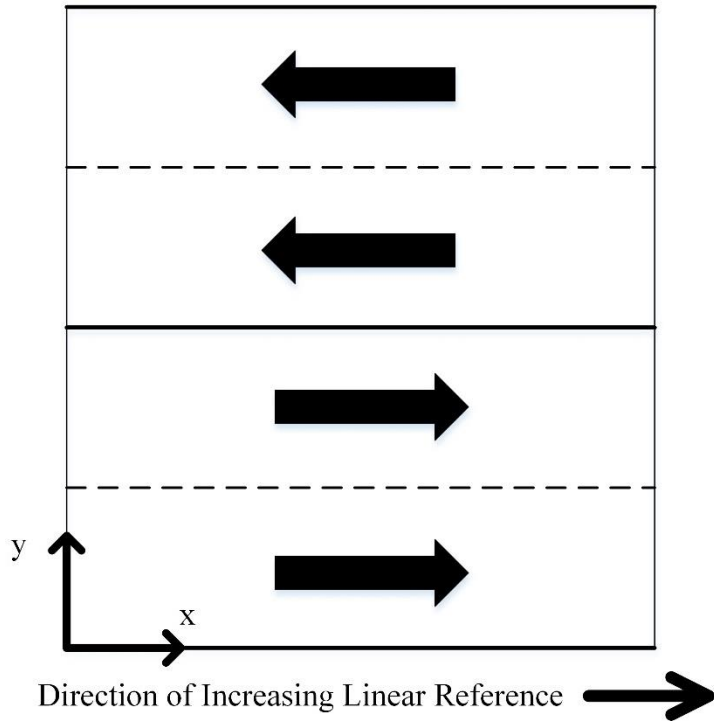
Illustration. Local coordinate origin for non-skewed single bridge with two-way traffic and a median barrier.
